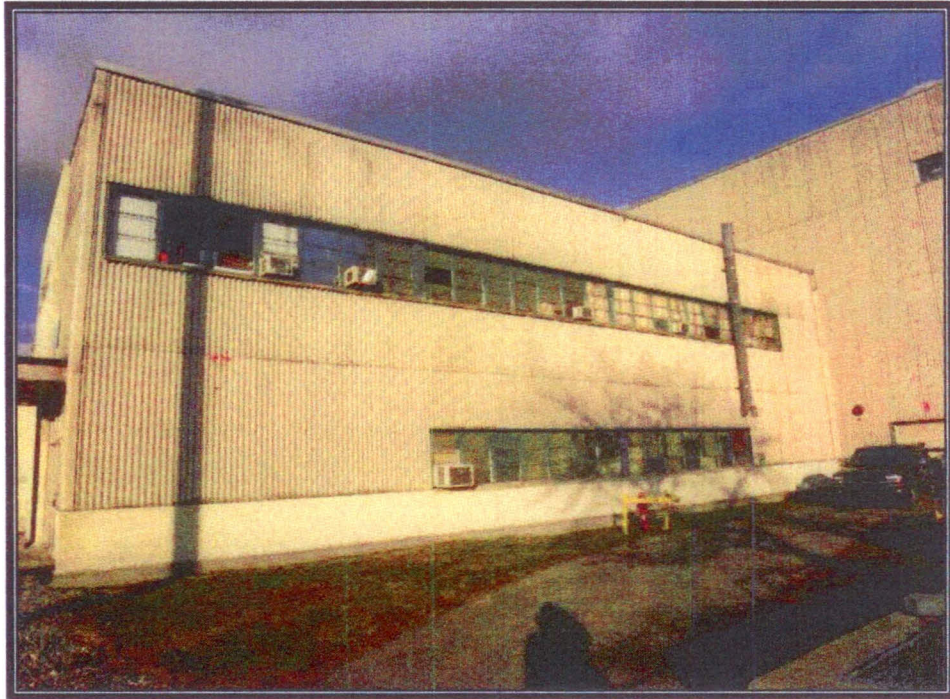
South wall of office building (Photograph by RCG&A, 2008)
